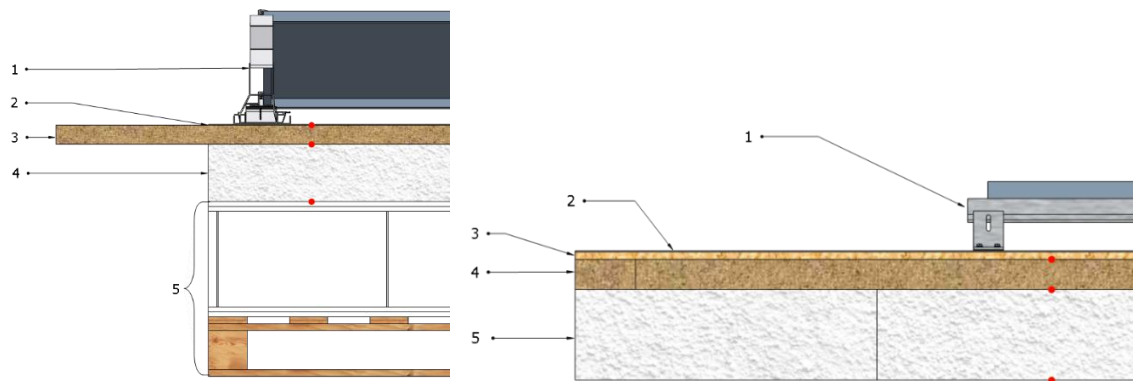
Specimen cross-section (side-view) for flat roofs (left) and pitched roofs (right)
